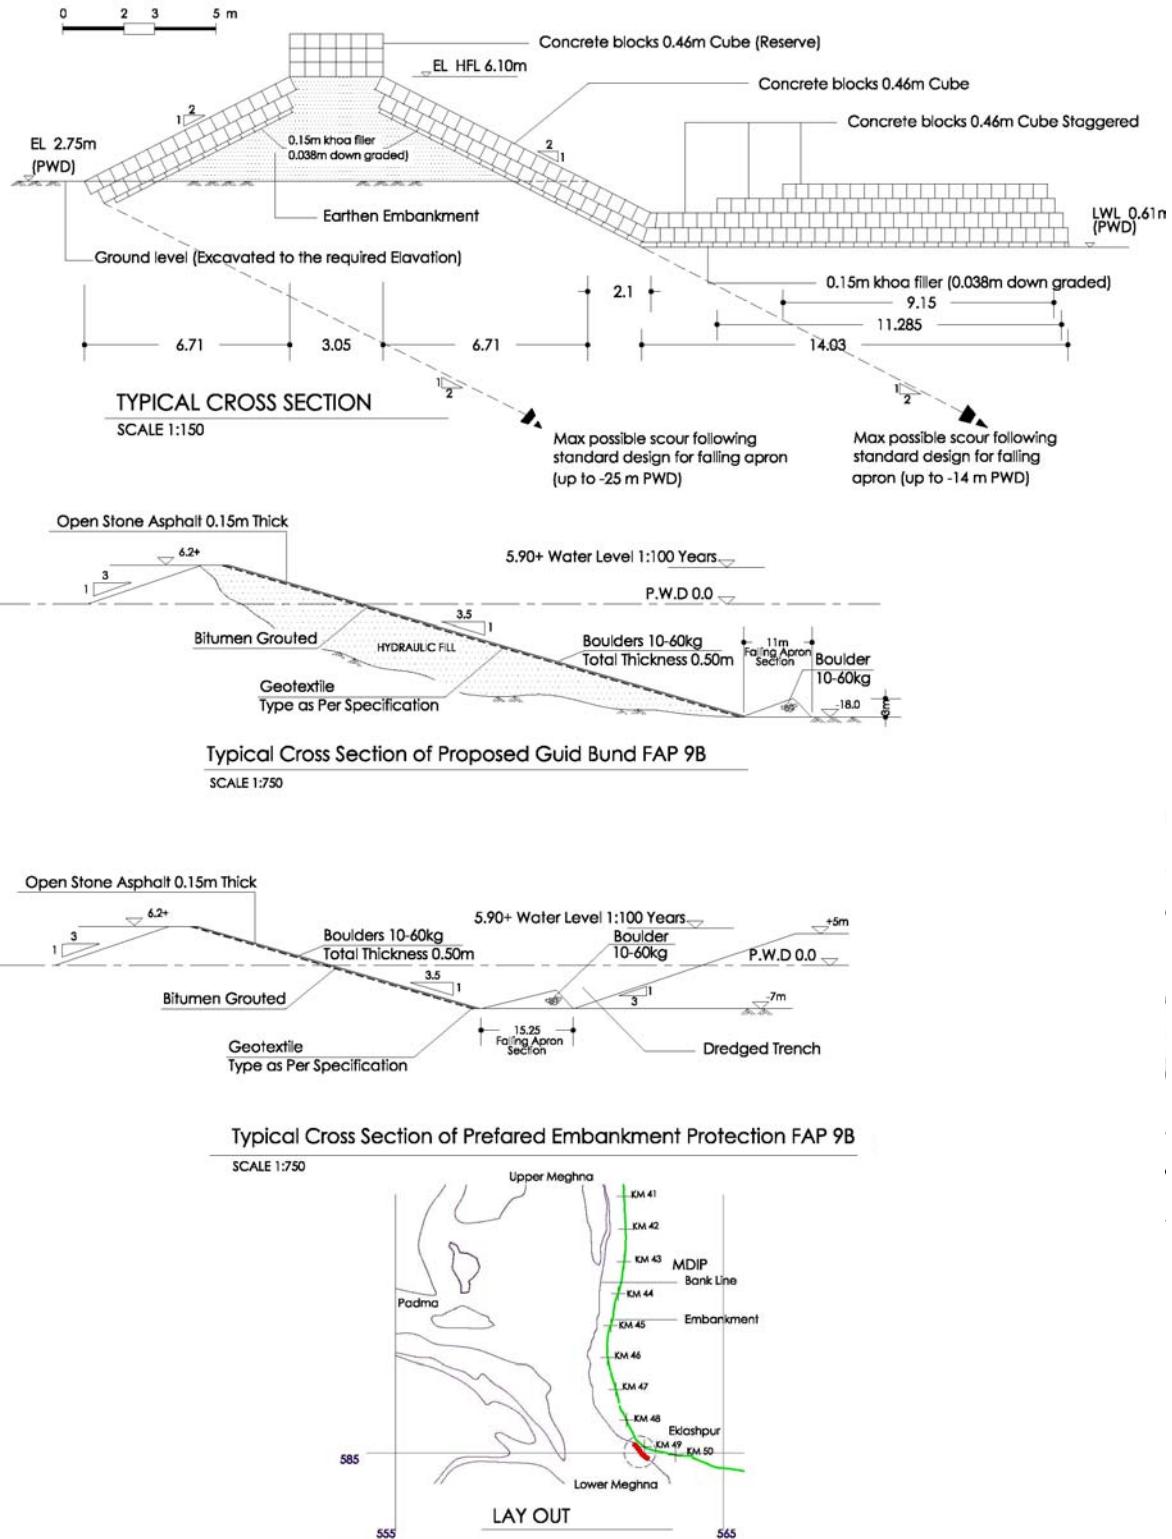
Typical cross-section of the Eklashpur Hard Point.
